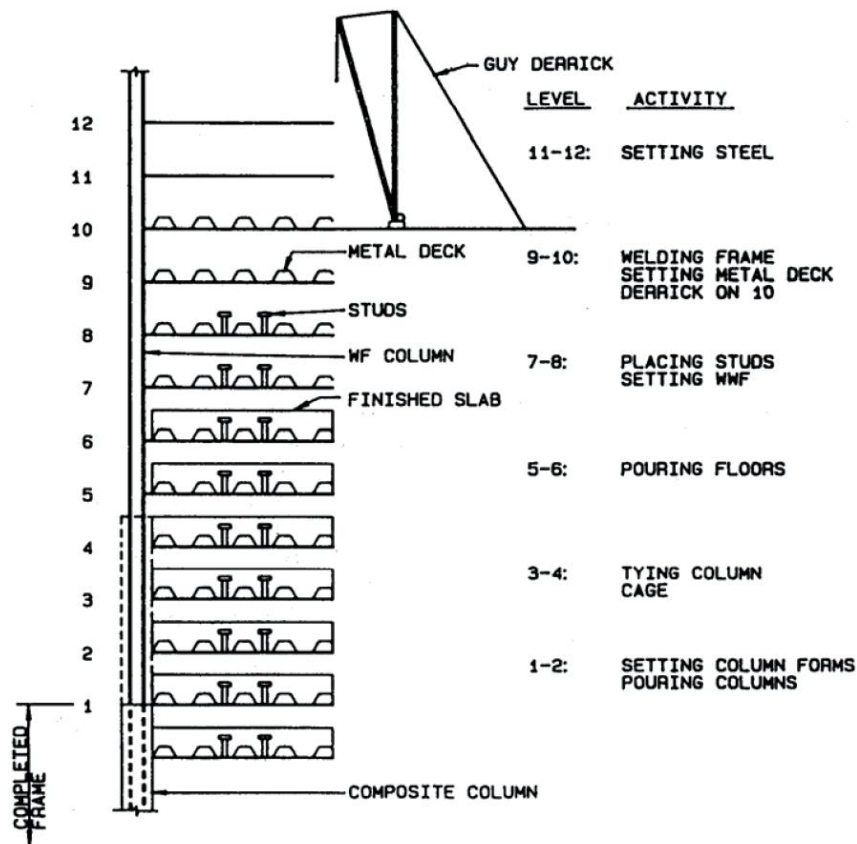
Construction process for a building with SRC columns (Viest et al. 1997)
